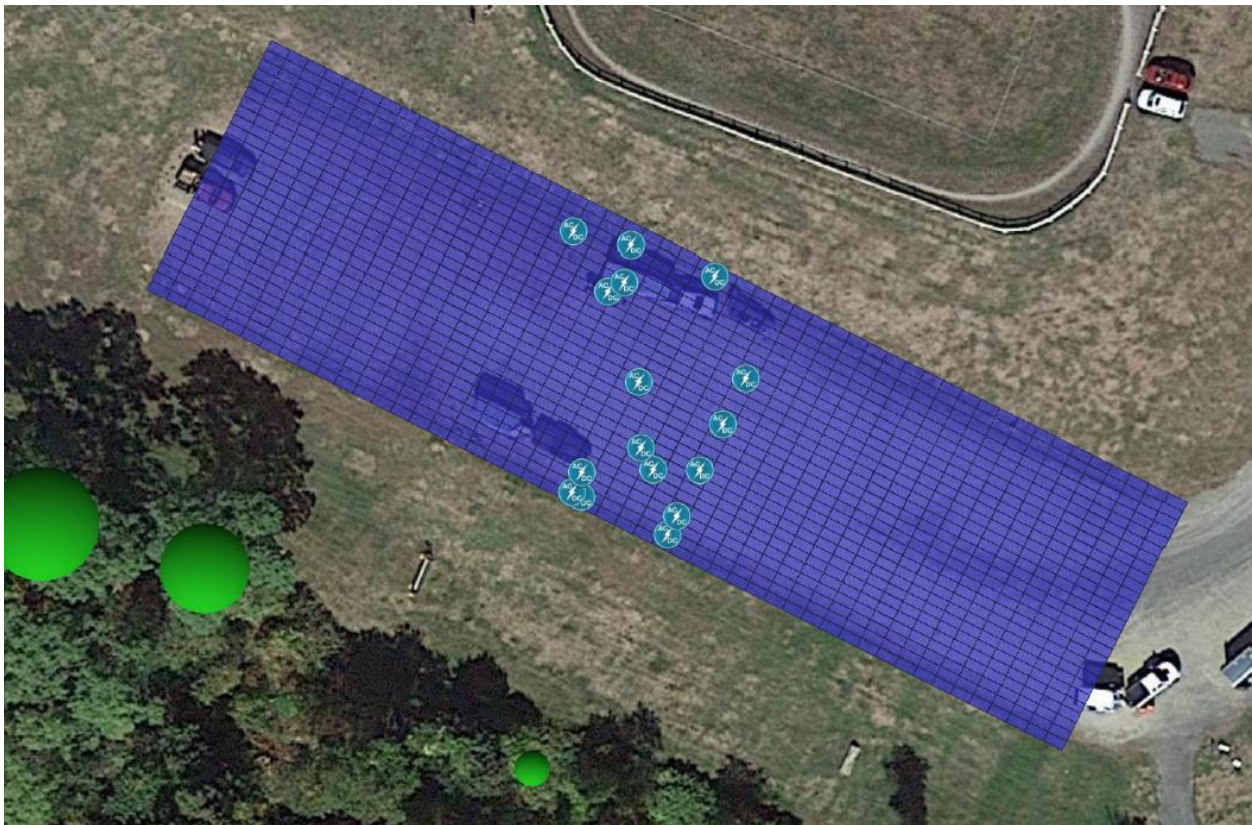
Location 1.5 Panel Layout – Canopy Parking.
